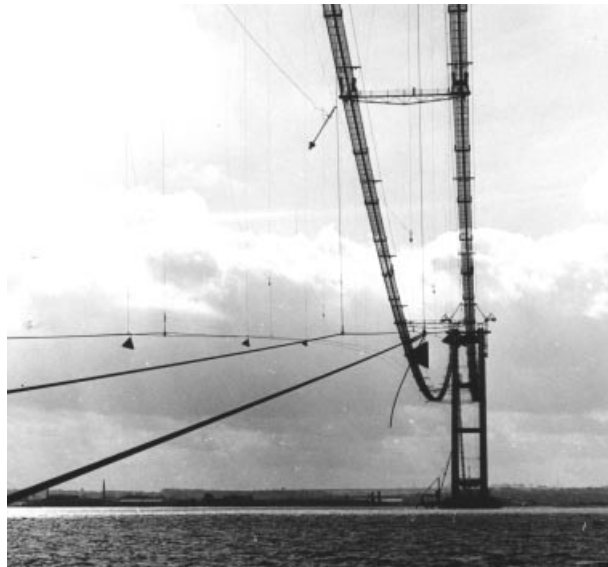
Anchoring of catwalk strands at the pylon top (Akashi Kaikyo Bridge)
